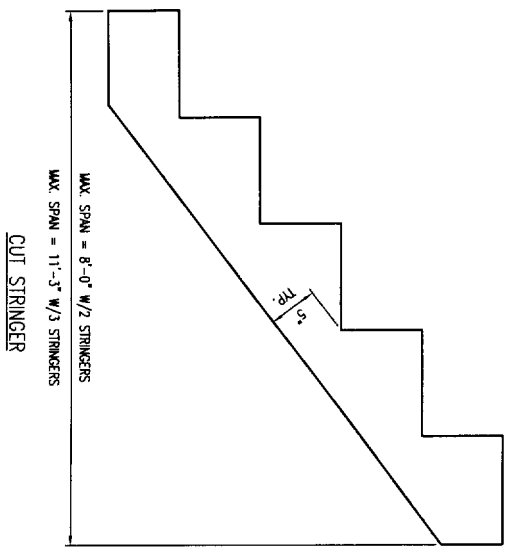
STAIR STRINGER REQUIREMENTS
